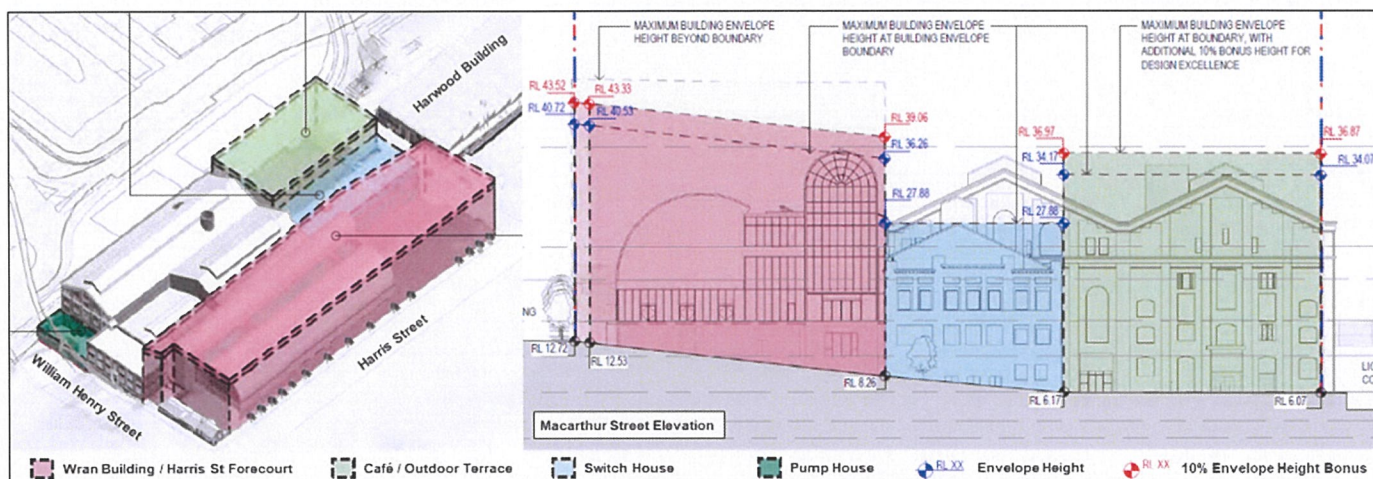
| Concept Approval building envelopes (Base source: SSD-32927319)
